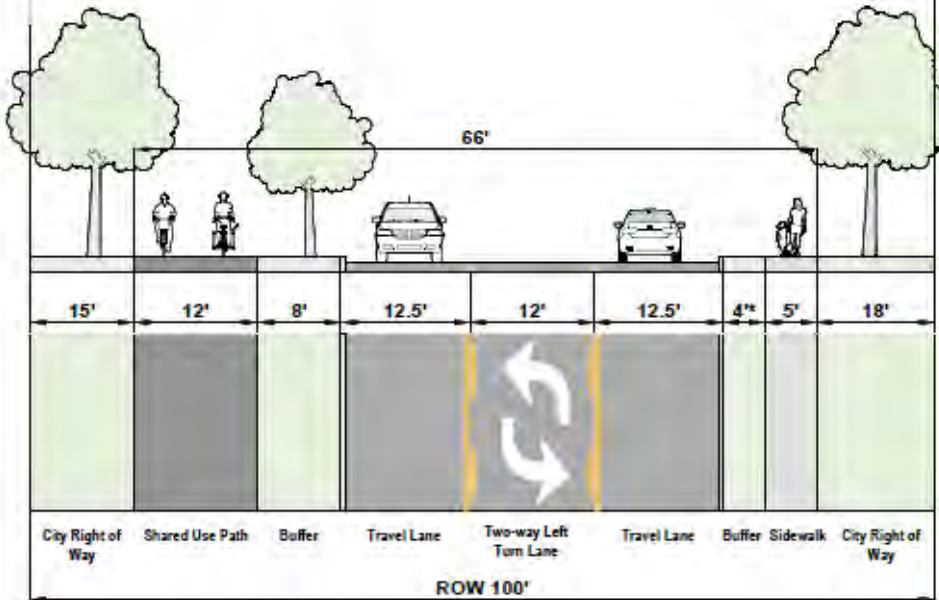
Looking north on Bowling Street SW, between Wilson Avenue SW and 29th Avenue SW
